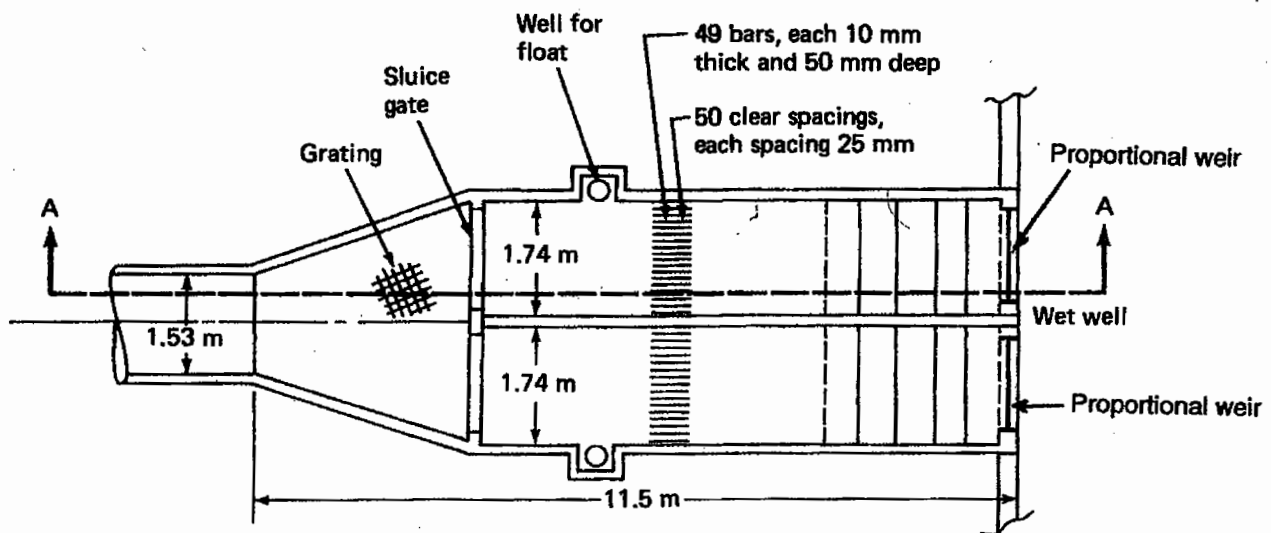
Design Details of Bar Rack. All Elevations Are with Respect to the Datum at the Floor of the Rack Chamber.
